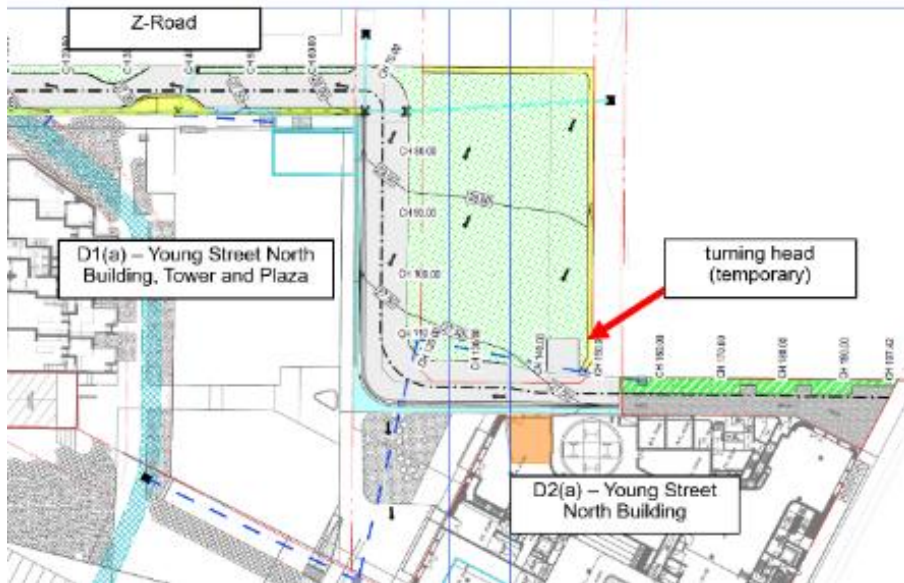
A temporary turning head will be provided within the publicly accessible open space, (red arrow) until future works to construct a clockwise road are completed
